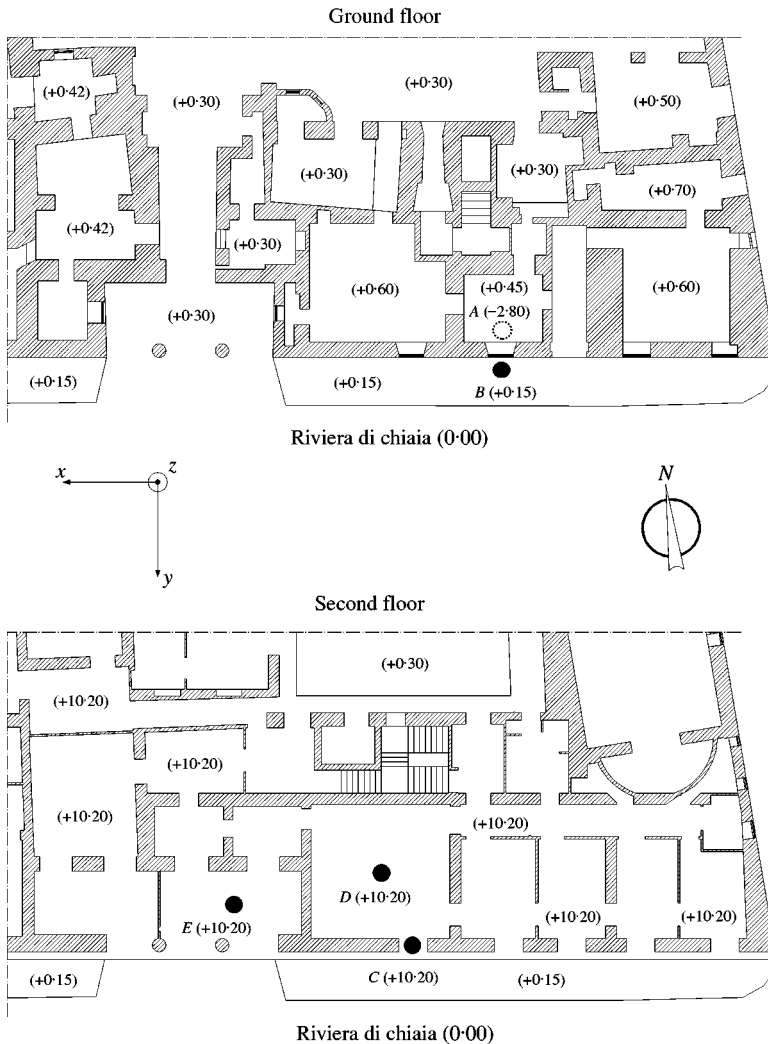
Plan of the building and of the measurement stations: Points A and B (Ground floor), Points C, D and E (second floor).
